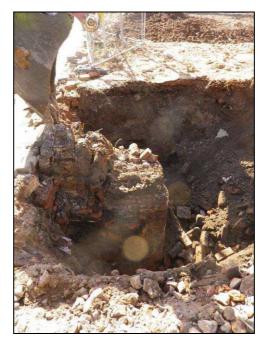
South facing photo of Stanchion 2 {1001} being excavated
